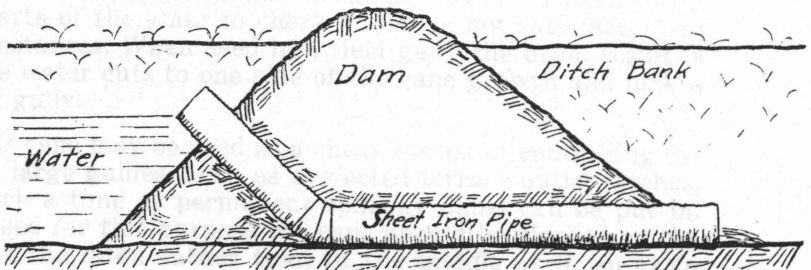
Soil saving dam with an outlet pipe of corrugated sheet metal. A concrete bulkhead, and a concrete collar in the earth dam would make this pipe more secure.
